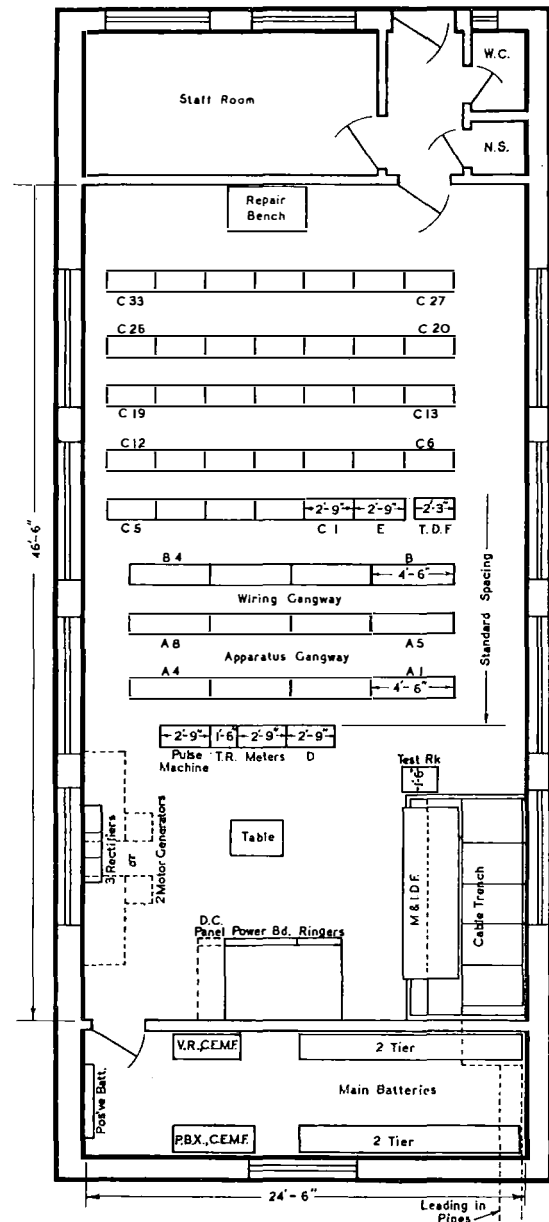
TYPICAL LAYOUT USING THE D OR E TYPE BUILDING.
